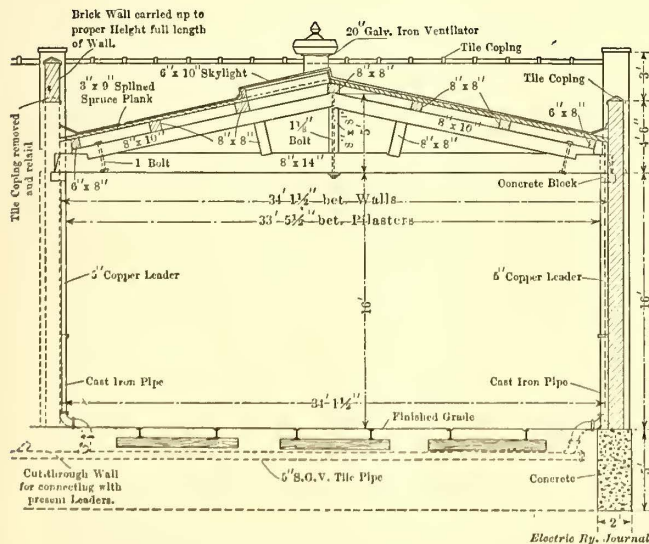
Track Maintenance—Wooden Roof Girders for Car House
